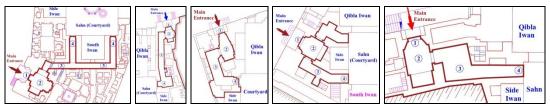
The horizontal corridor in Mamluks religious buildings [author]
